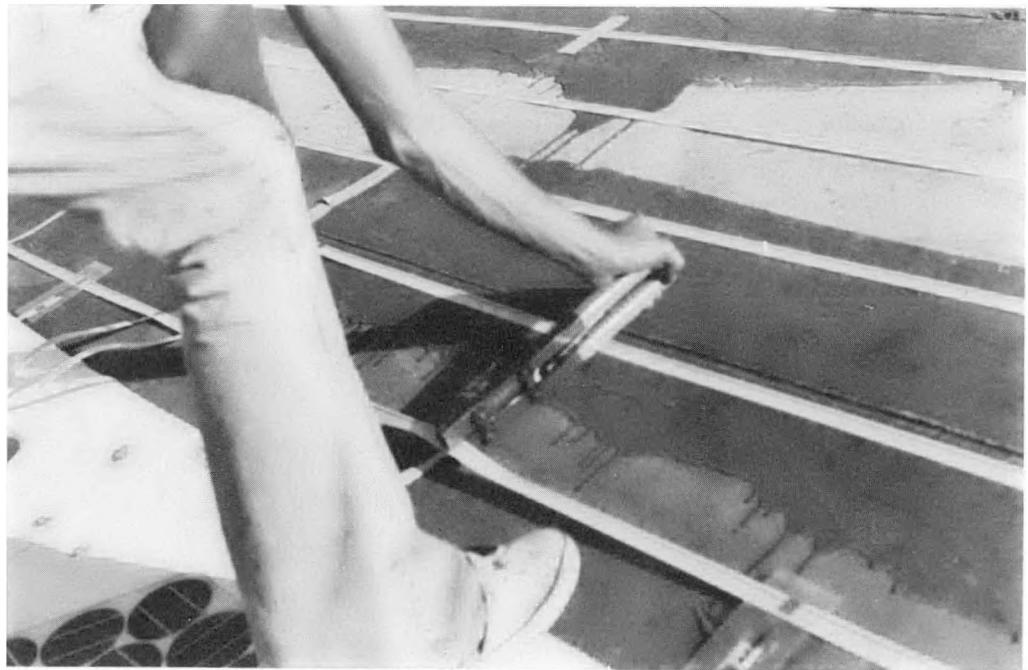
Use of the Crimp Tool for Module Interconnection
